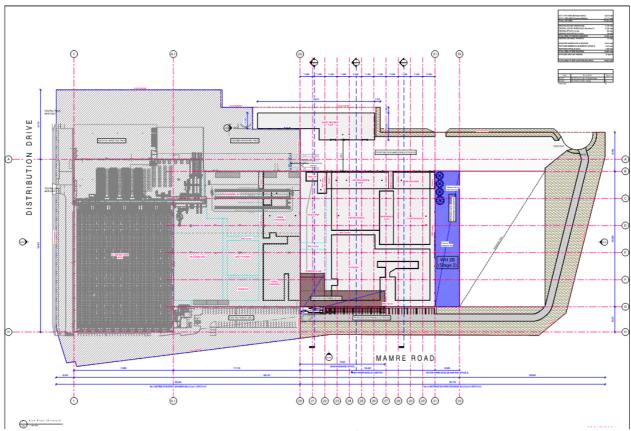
Proposed Site Plan (Source: HL Architects, 2021)
